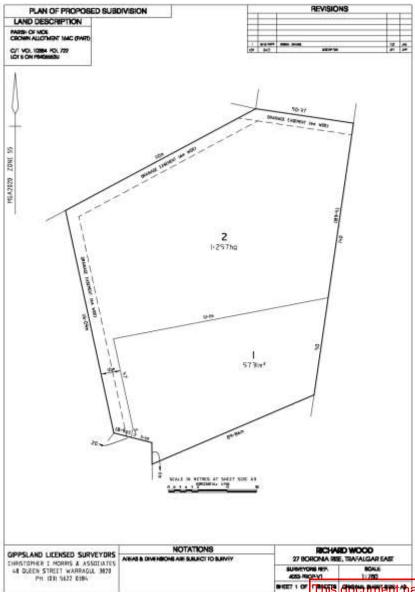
PLAN OF PROPOSED SUBDIVISION TO BE ENDORSED
